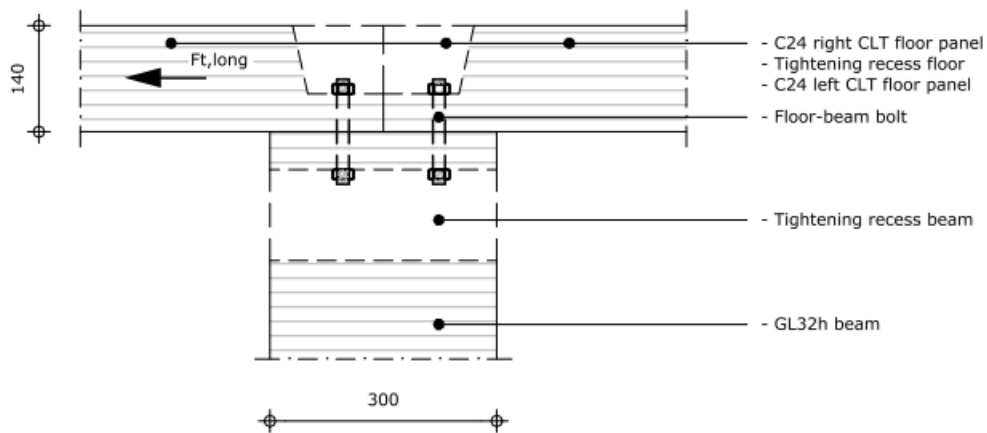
Cross-section C-C of Figure 10-7 floor-to-beam connection longitudinal diaphragm tension in mm
